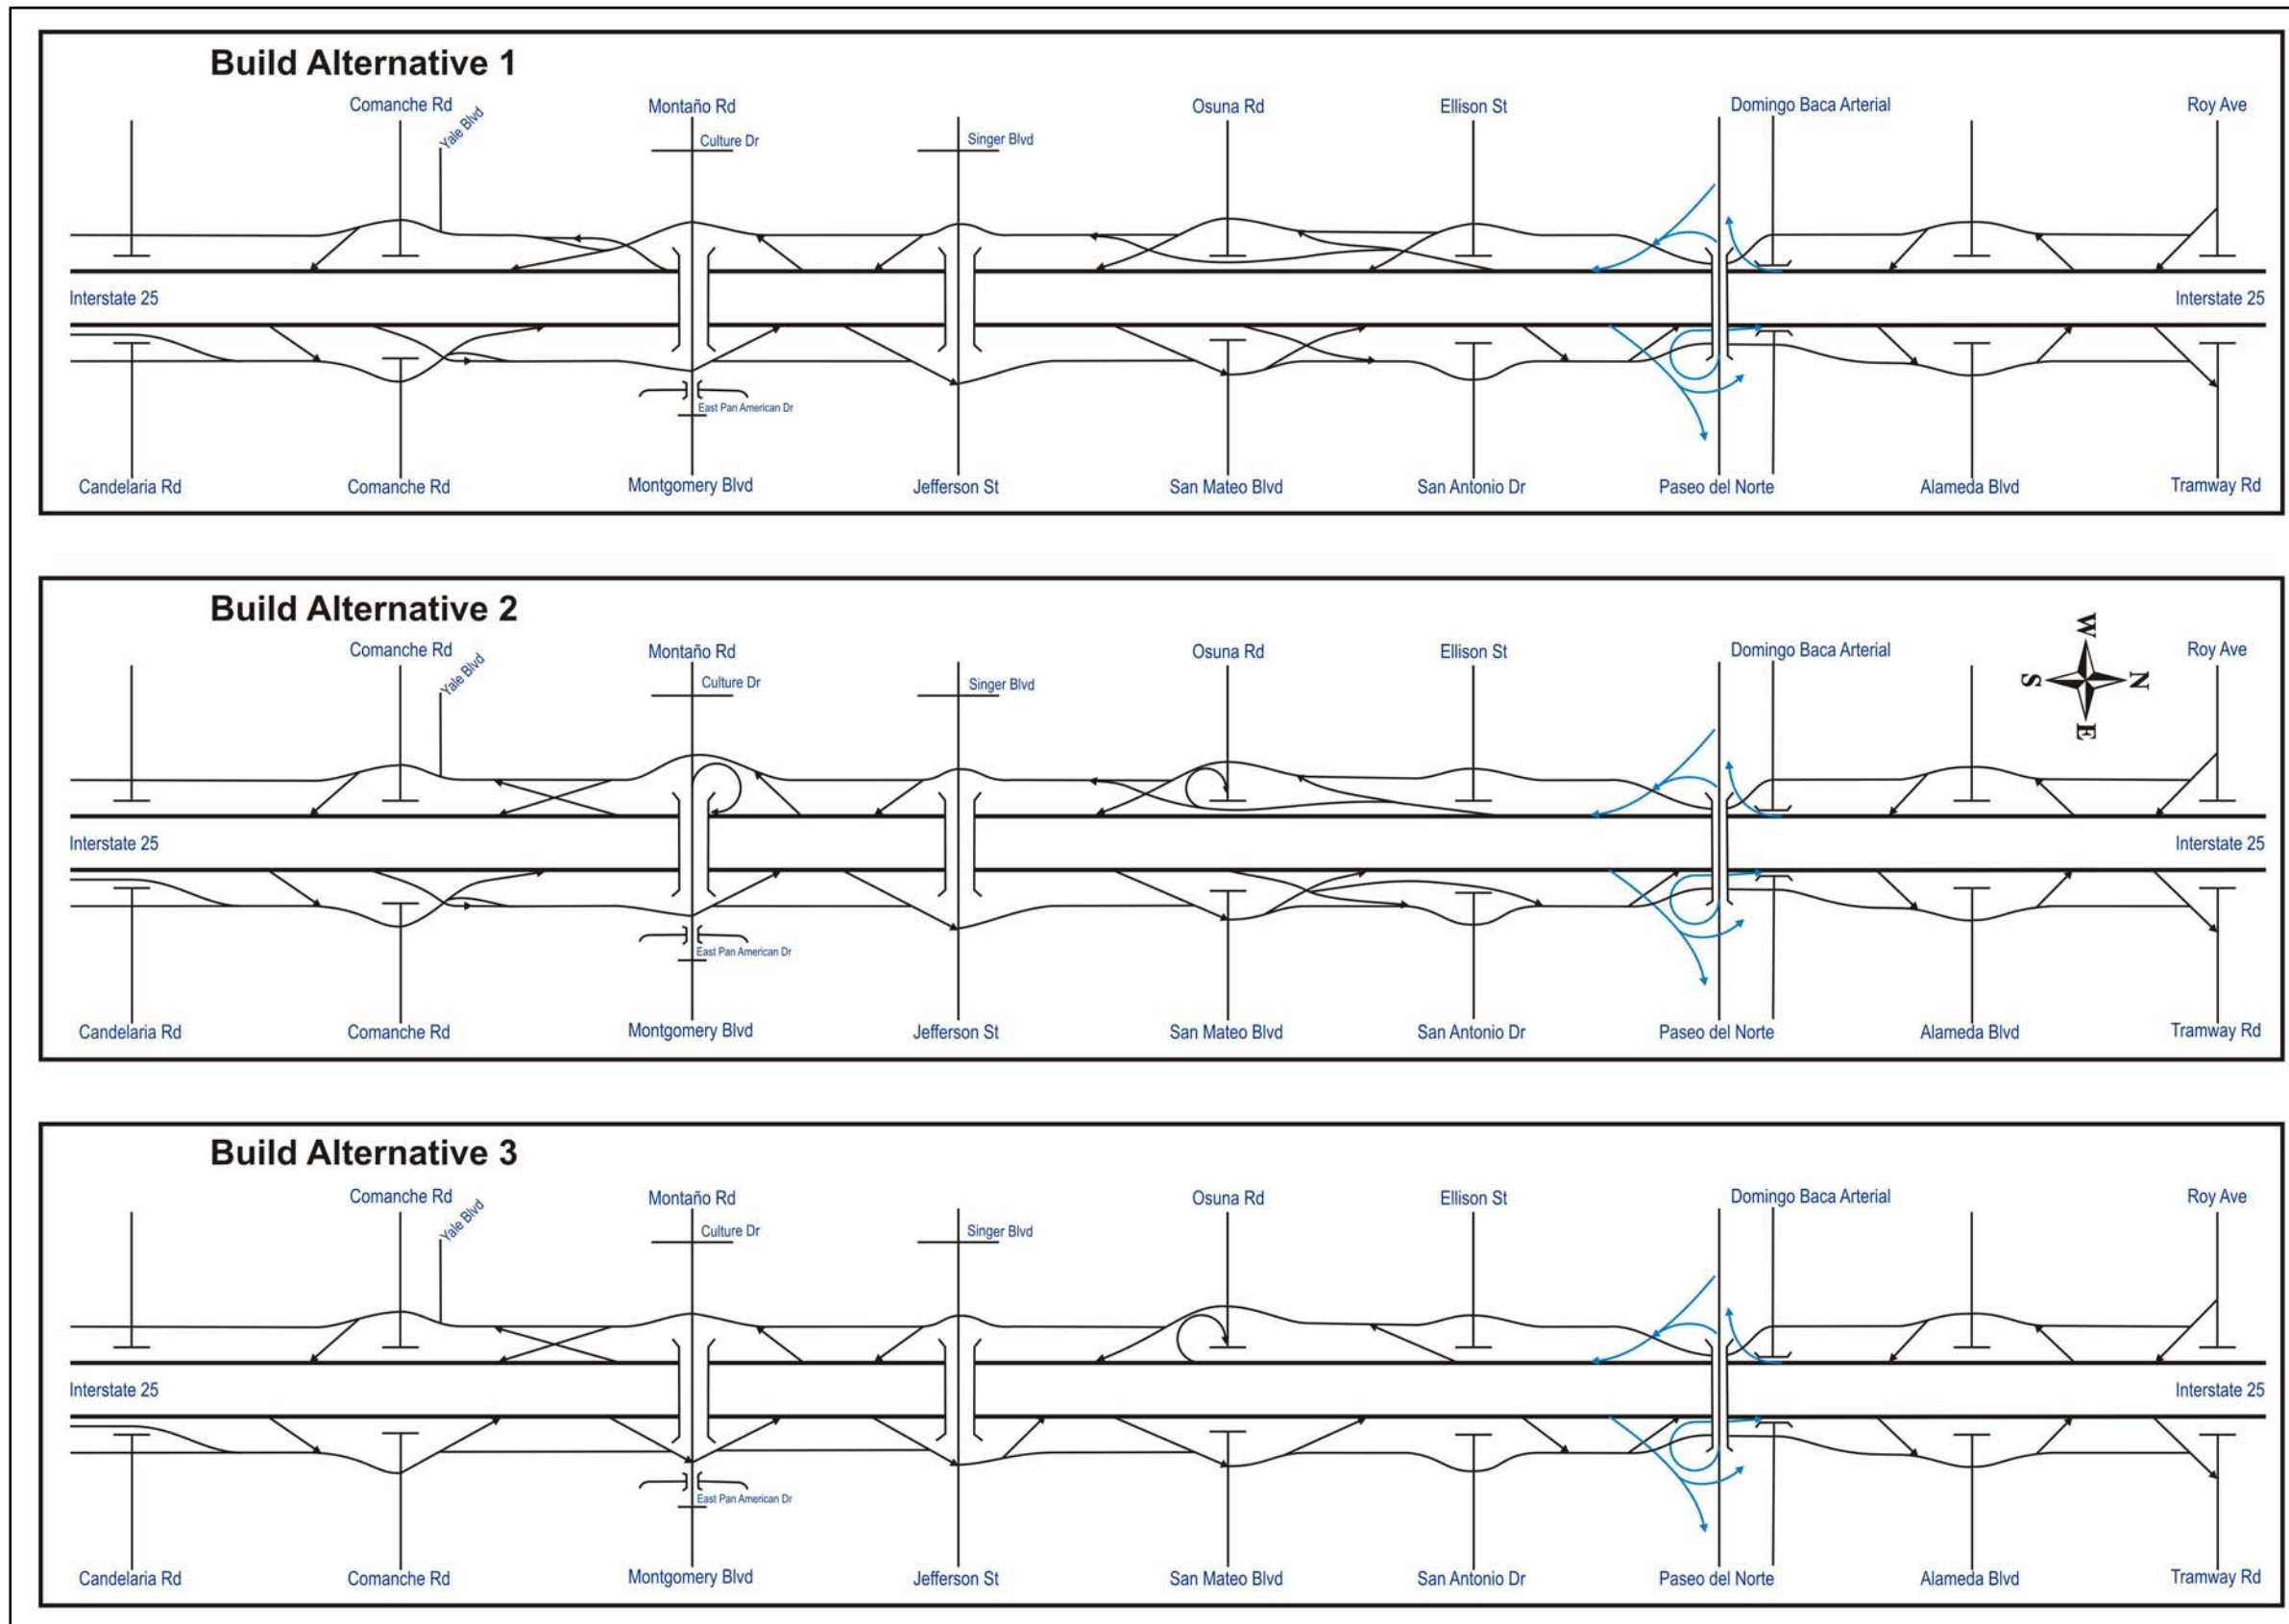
, Schematic Line Sketches of the Proposed Build Alternatives
